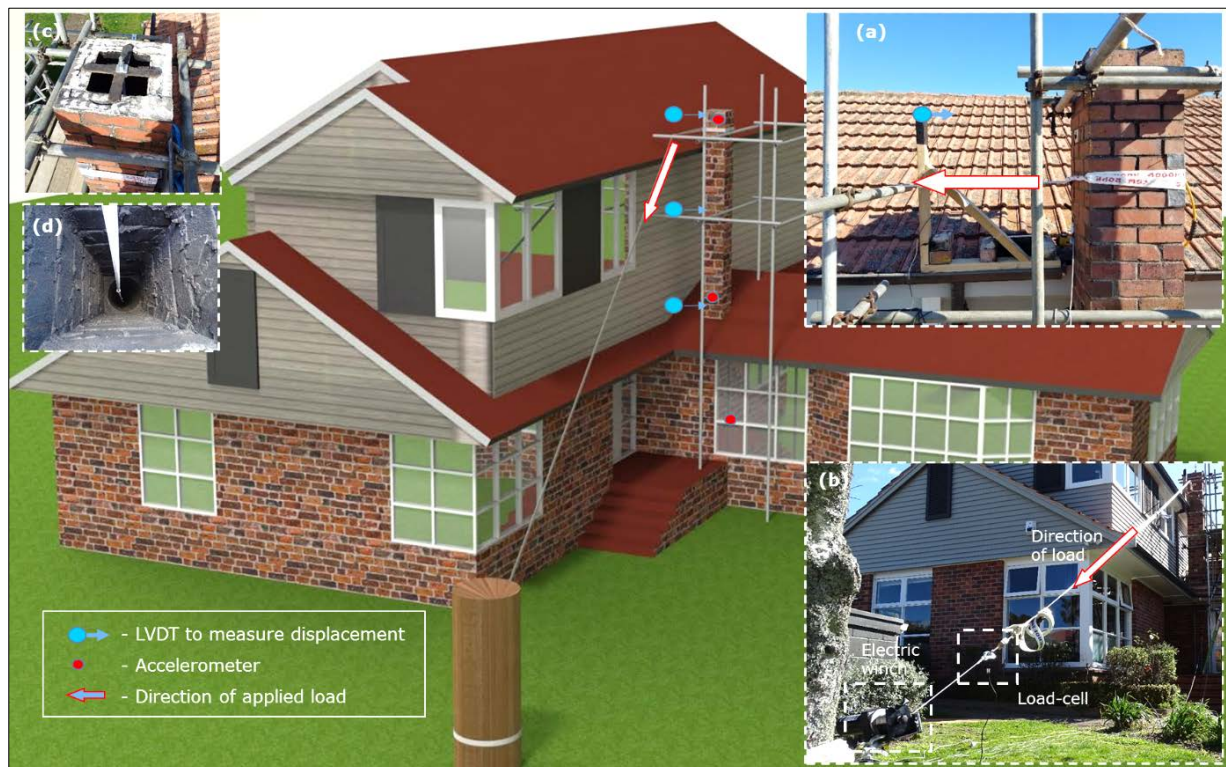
Schematics of loading and instrumentation-setup for chimney A1: (a) Top portion of chimney showing loading direction and location. (b) Location of load-cell and load application mechanism. (c) Top portion of chimney showing cruciform anchor plate for PT retrofit. (d) PT threaded steel rod inserted down chimney flu.
